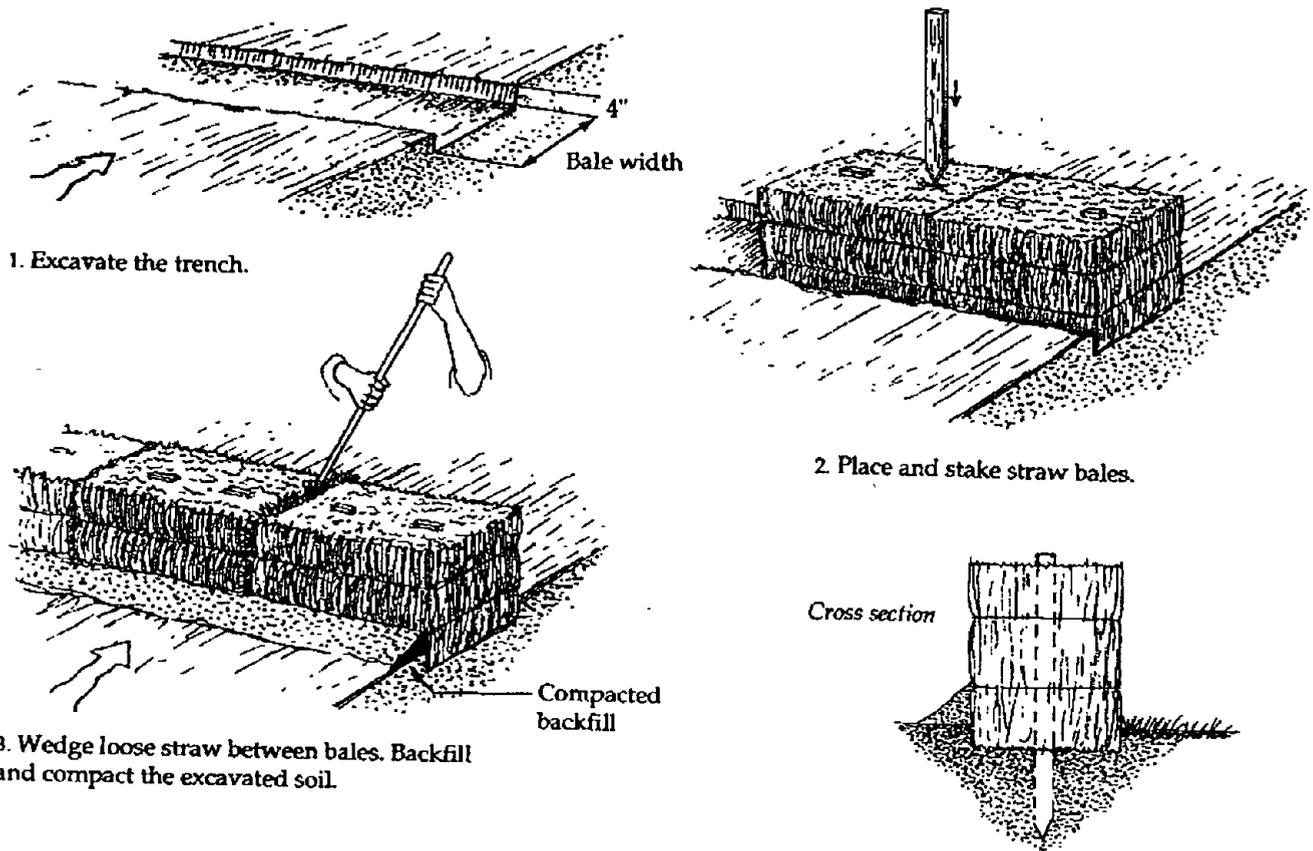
Placement and Construction of a Straw Bale Barrier
